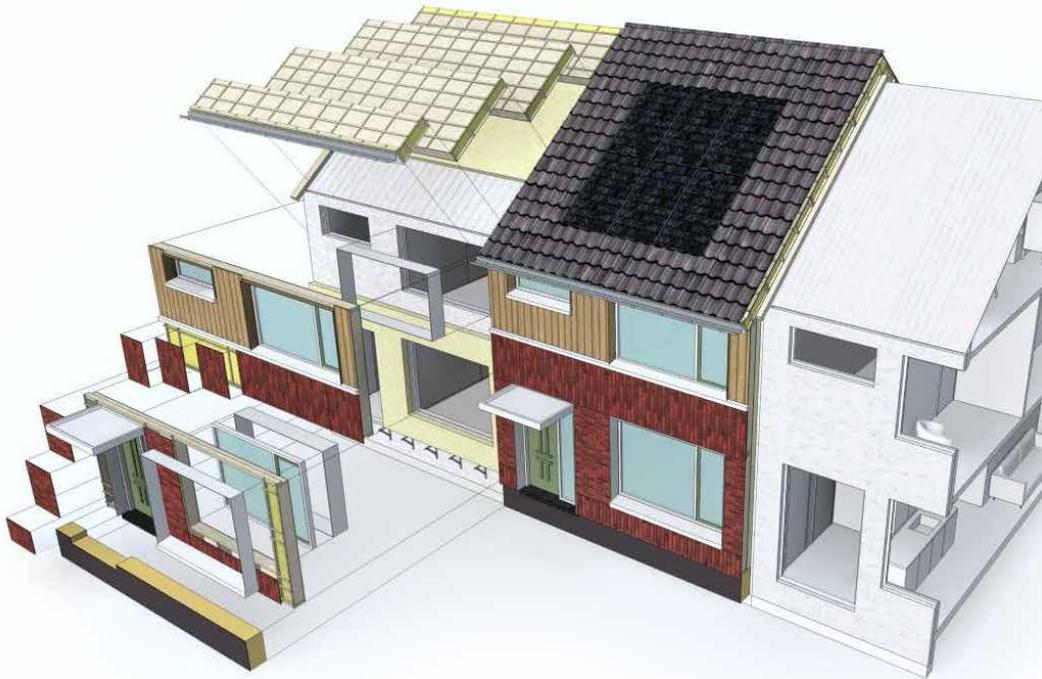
Circular skin concept design (image made by Villanova architecten)
